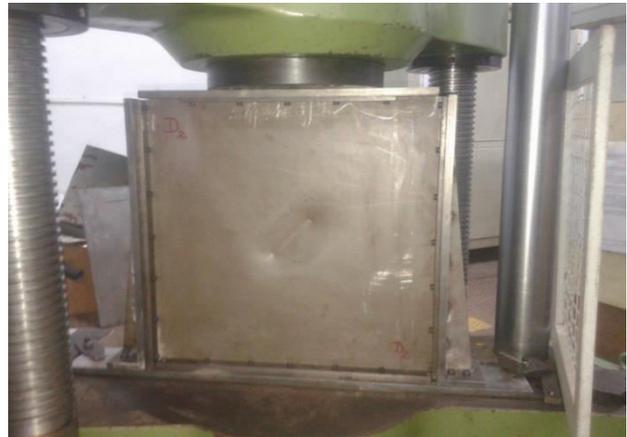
Photograph of the test setup with inclined dented plate D2 compressed axially on the UTM machine.
